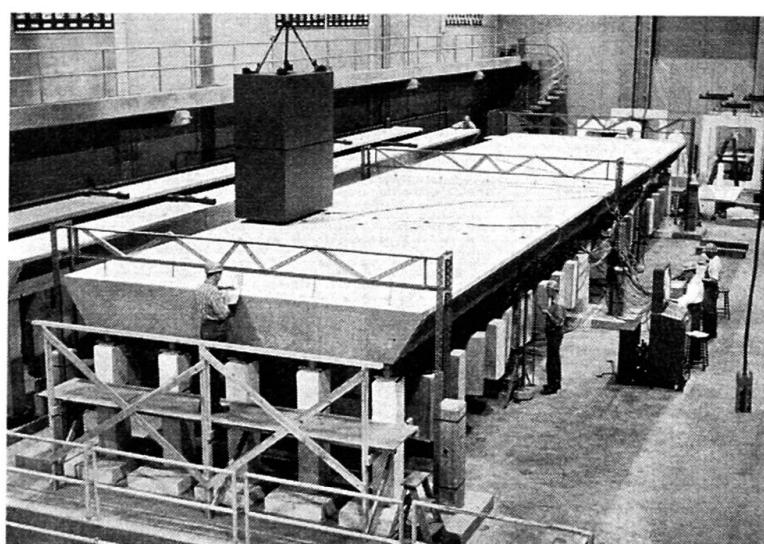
Influence Surface Test of Half-Scale Highway Bridge.
